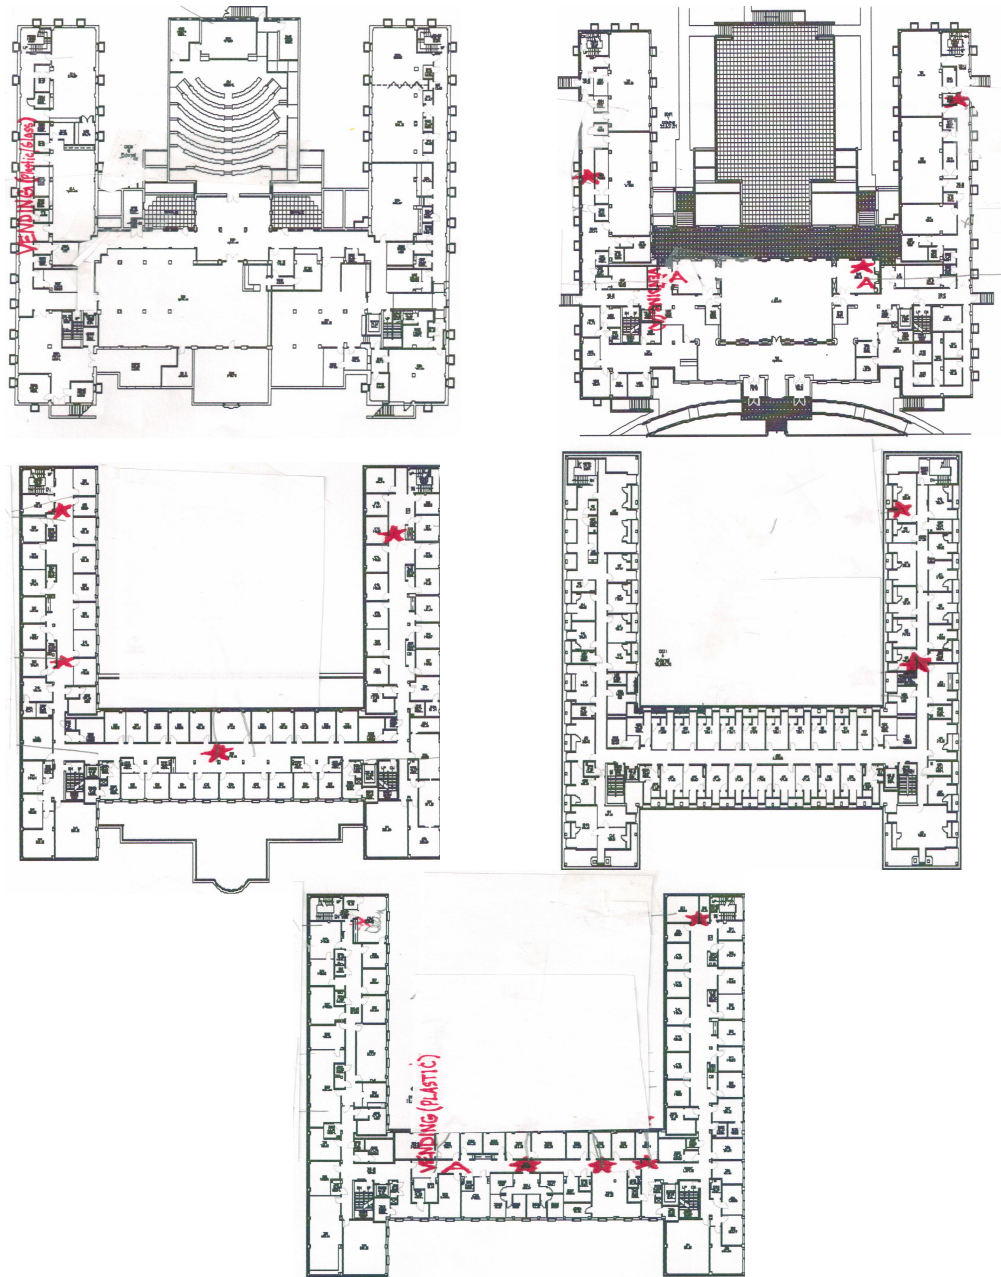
Academic Building Floor Plan, basement through 4th floors; vending machines noted; red star denotes white paper receptacle; red “A”=aluminum receptacle.
